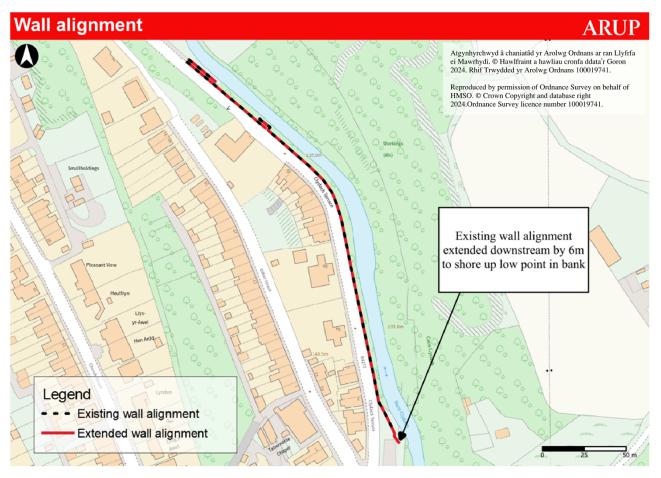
Extent of existing and proposed wall, which has been extended by approximately 6m downstream
